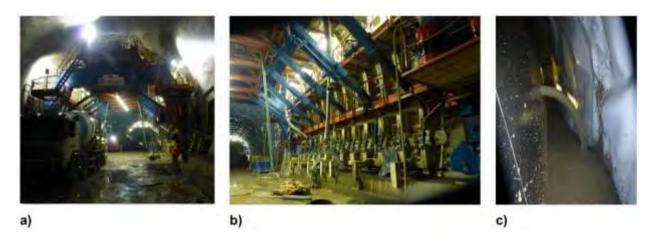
(a) Formwork; (b) steel structure of the formwork; (c) concreting (left: formwork, right; sealing membrane).
